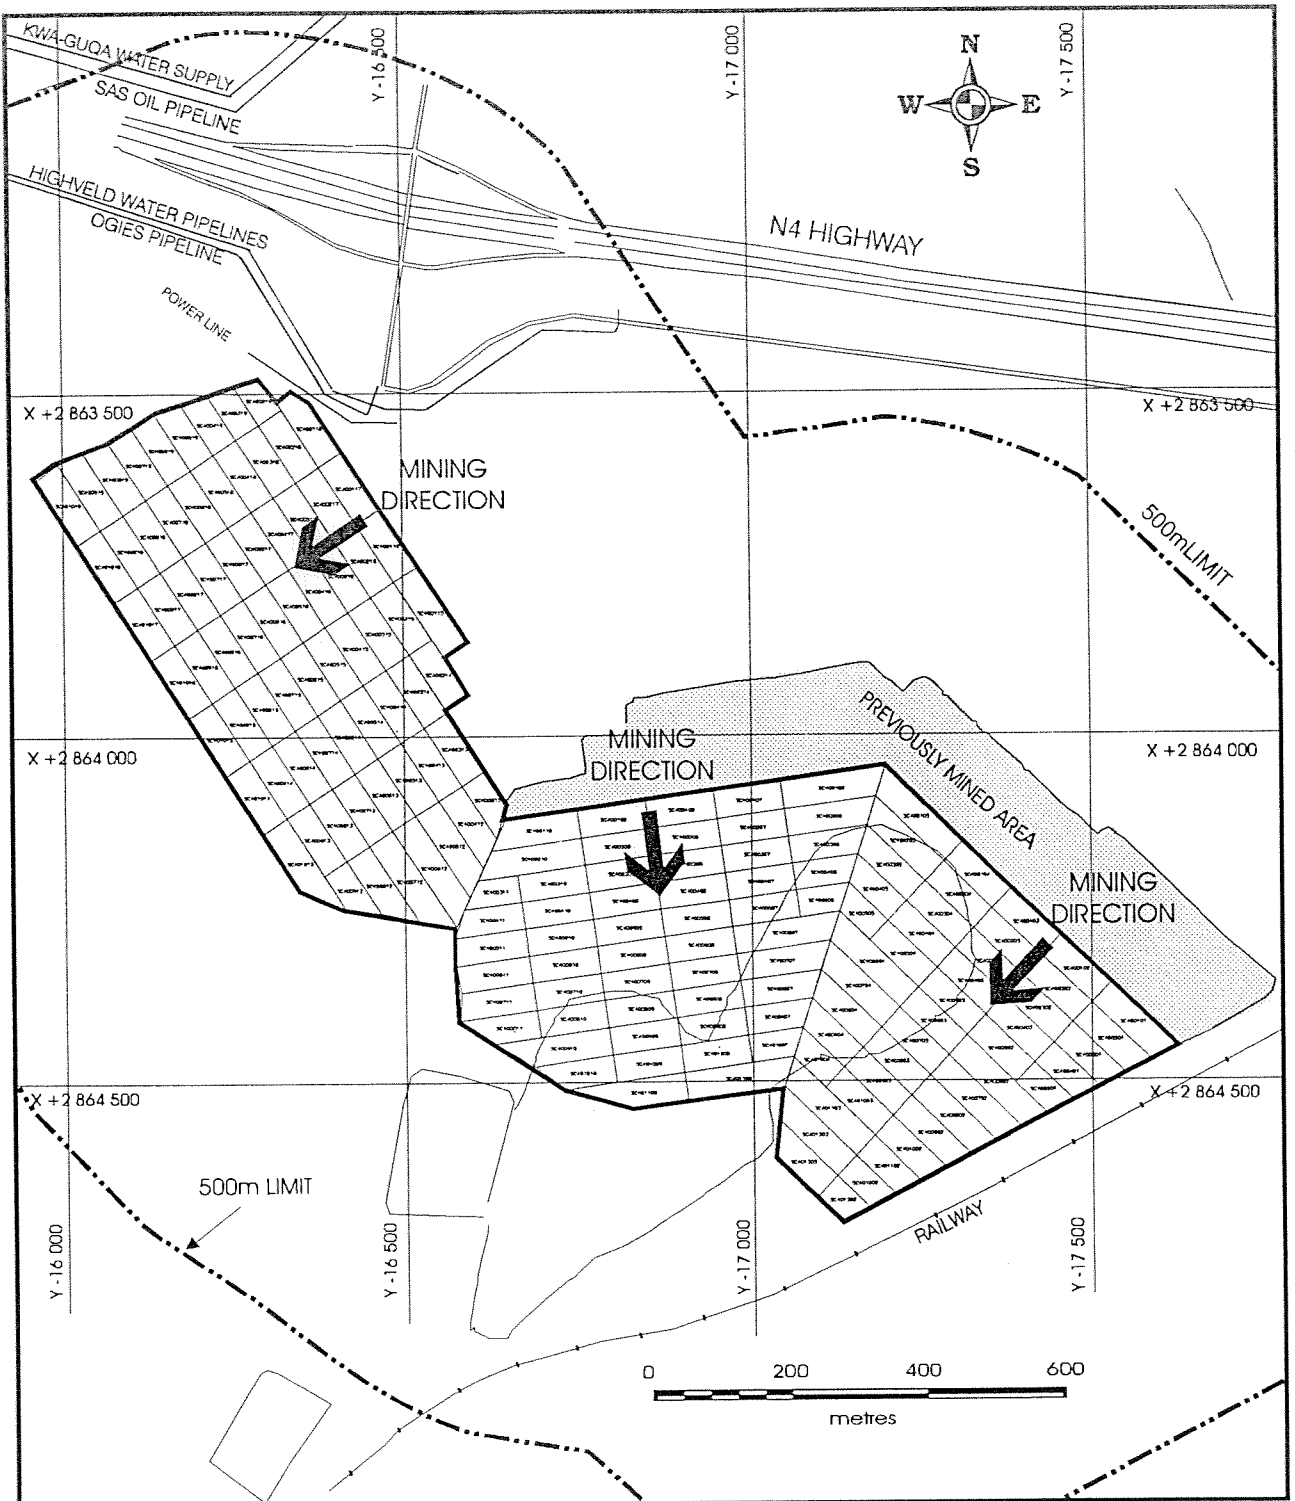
PLAN VIEW OF THE SCHOONGEZICHT MINI-PIT SHOWING THE PLANNED MINING CUTS.
